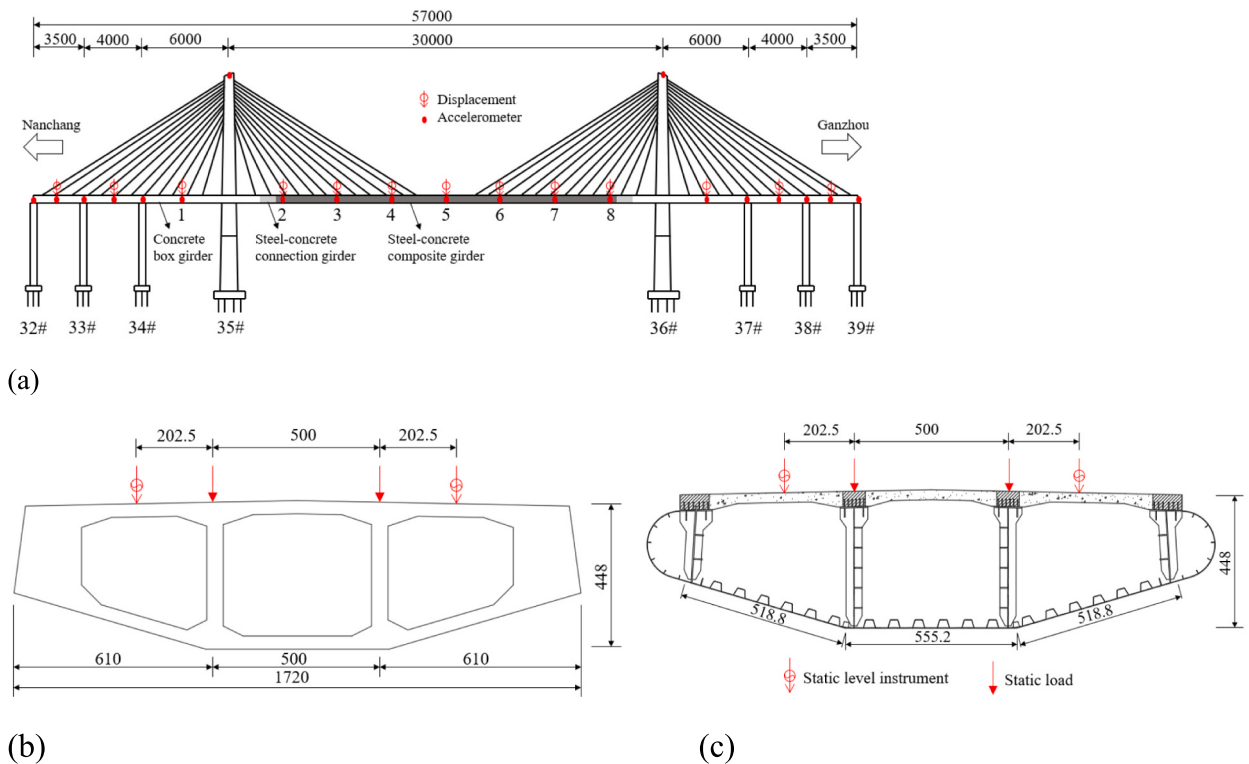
The GJ Bridge: (a) Configuration of the bridge elevation, (b) concrete box girder and (c) composite girder (dimensions in cm).
